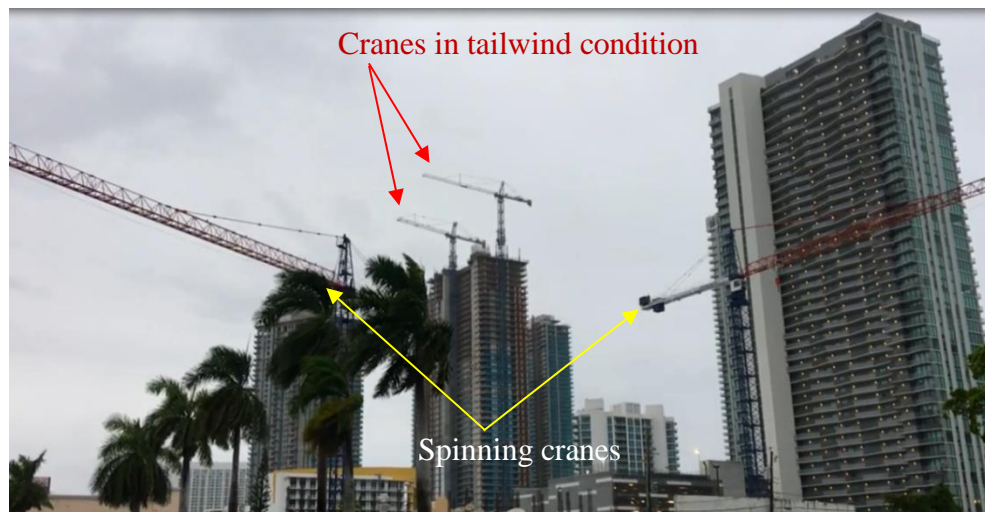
Tailwind condition of cranes at the second failure site – looking northeast
